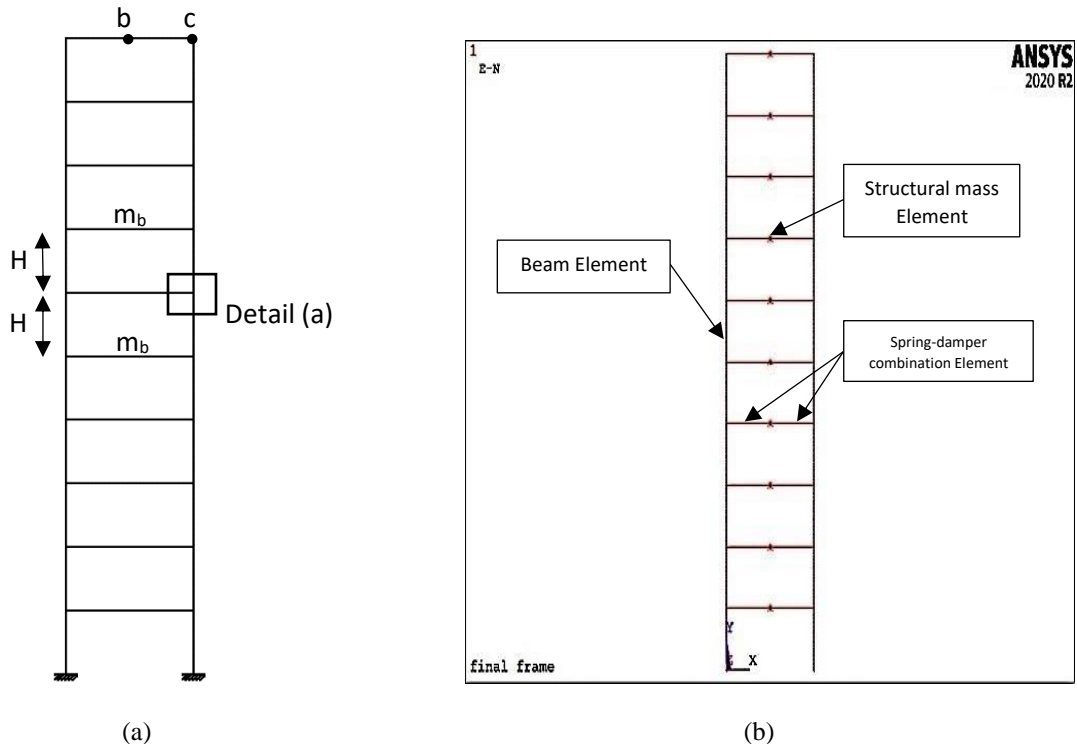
a) The proposed frame, detail (a) is the proposed connection from Fig.1, b) The frame model on ANSYS 2020 with detailed elements.
